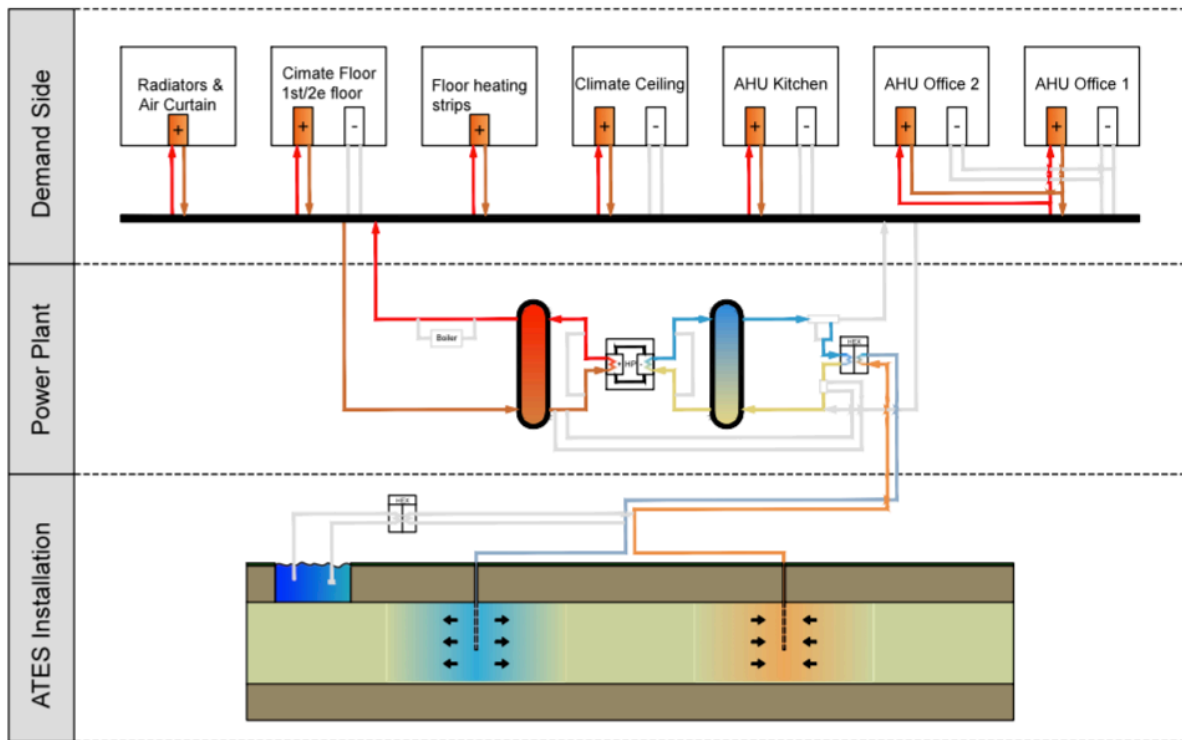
Installation principle ATES and HVAC system Ziggo office building.
